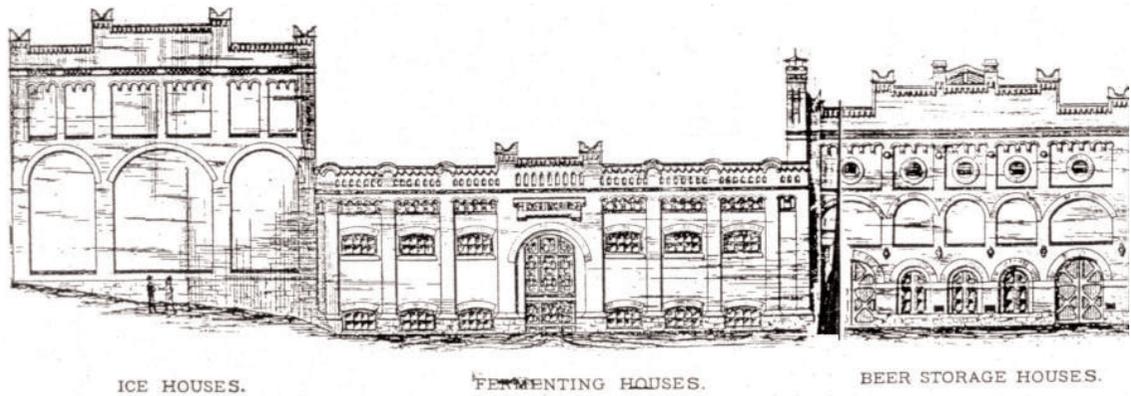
Edmund Jungenfeld, architect: Ice, Fermenting, Beer Storage Houses elevation, detail of Additions to Anheuser-Busch Brewing Association, St. Louis, 1879. Source: *The Western Brewer*. IV, 12, December 1879, unpagged foldout supplement.
